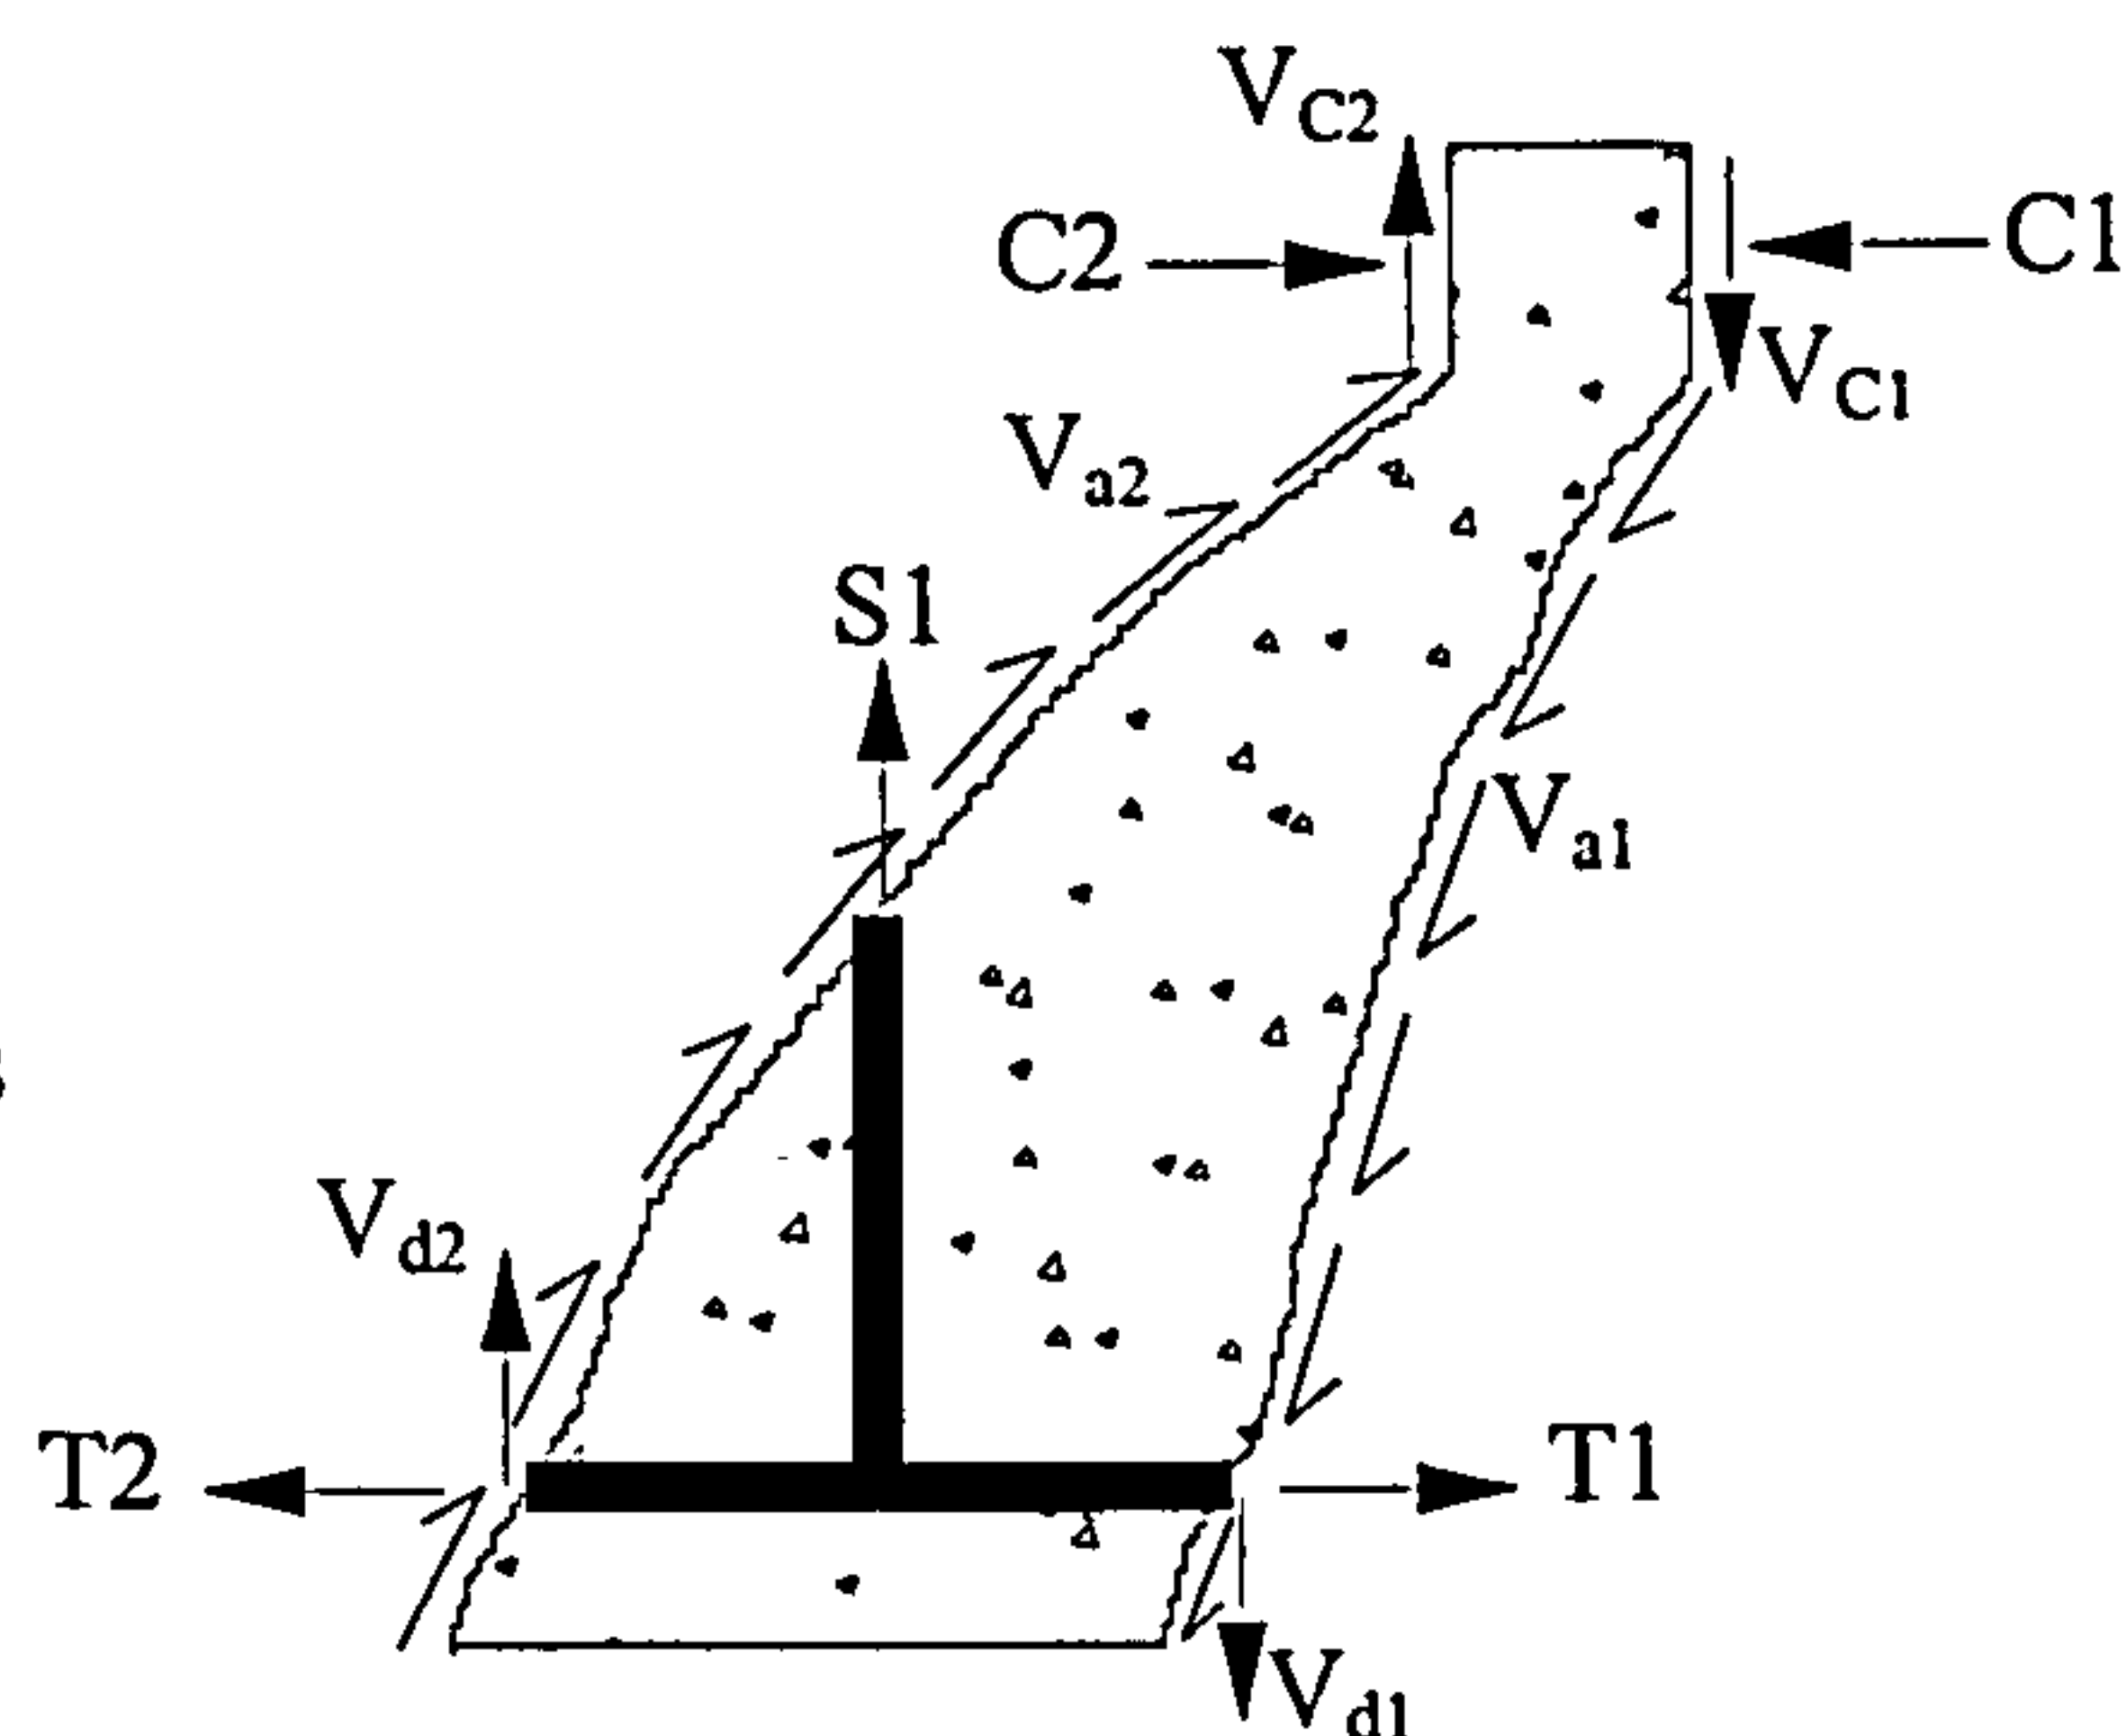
Concrete teeth in the shear span and the internal resistance mechanisms (after Park and Paulay 1975).
